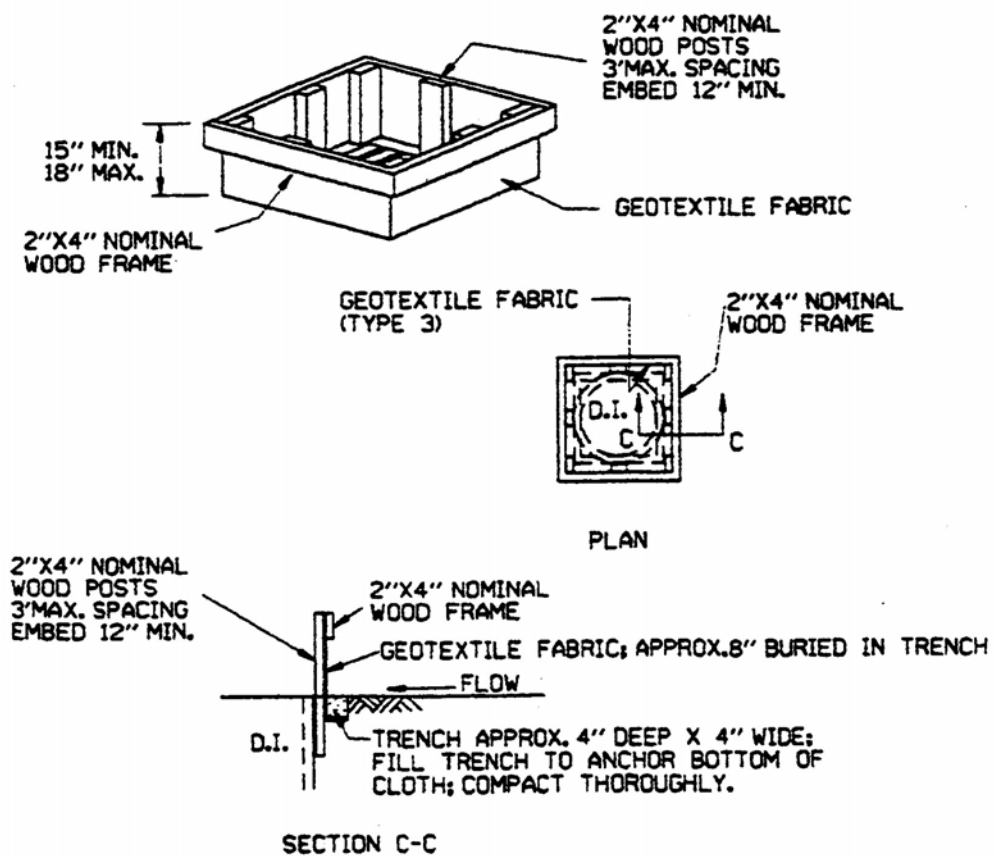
Silt fence inlet protection detail (Source: AHTD, 2001)
